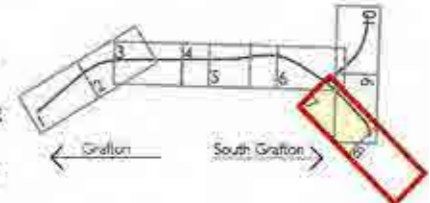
URBAN DESIGN AND LANDSCAPE CONCEPT PLAN – SHEETS 7 & 8
